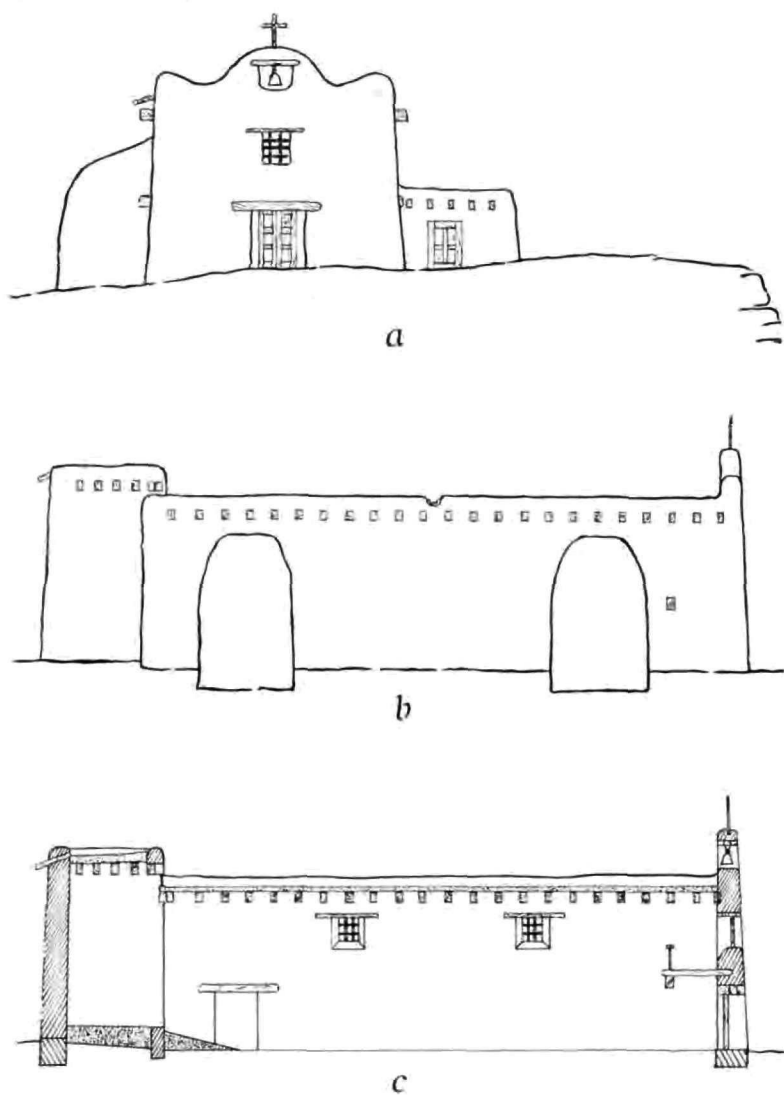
Hypothetical restoration drawings: a. front elevation from the south; b. side elevation from the west; c. section through center of the church.
